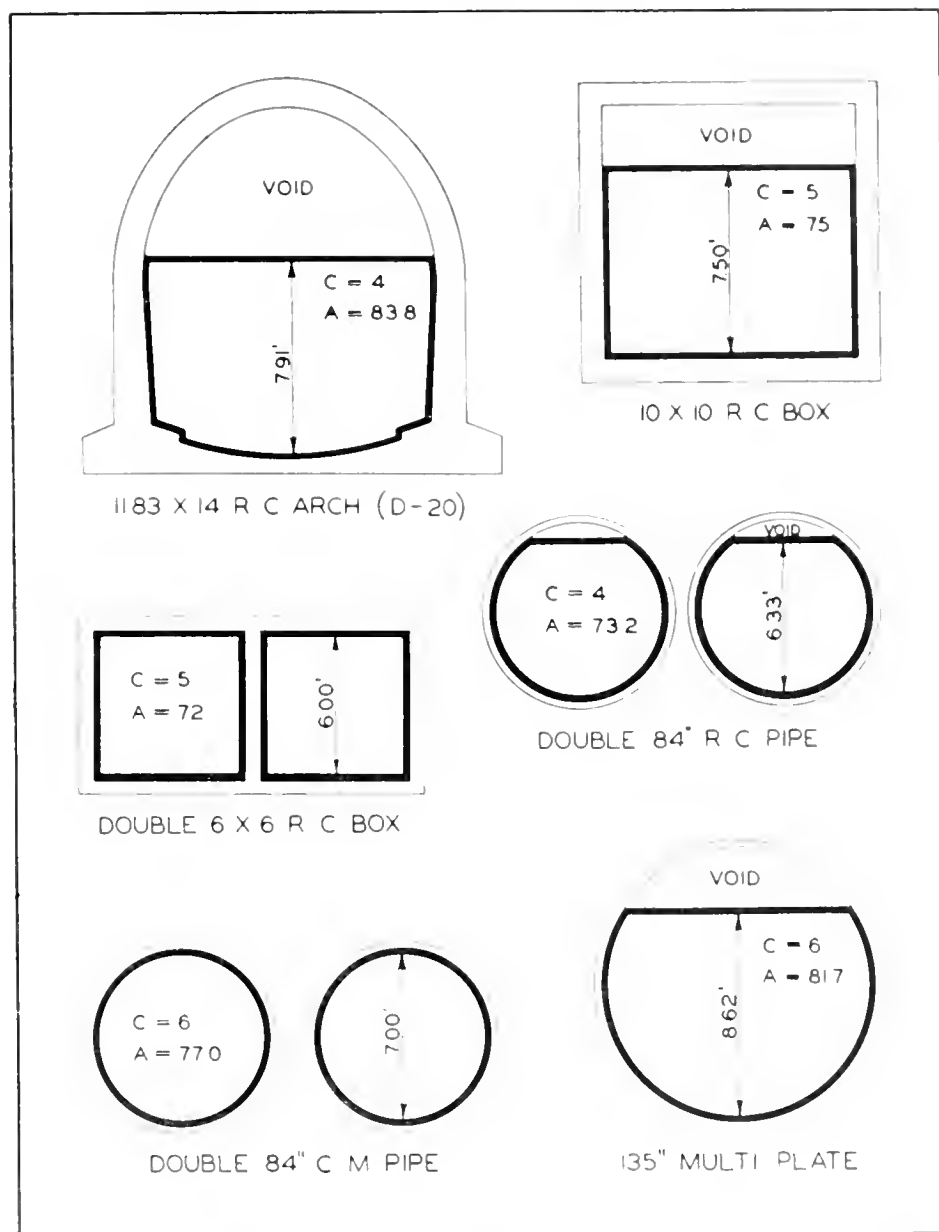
Application of rated waterway limitation to typical free-outlet culvert sections
